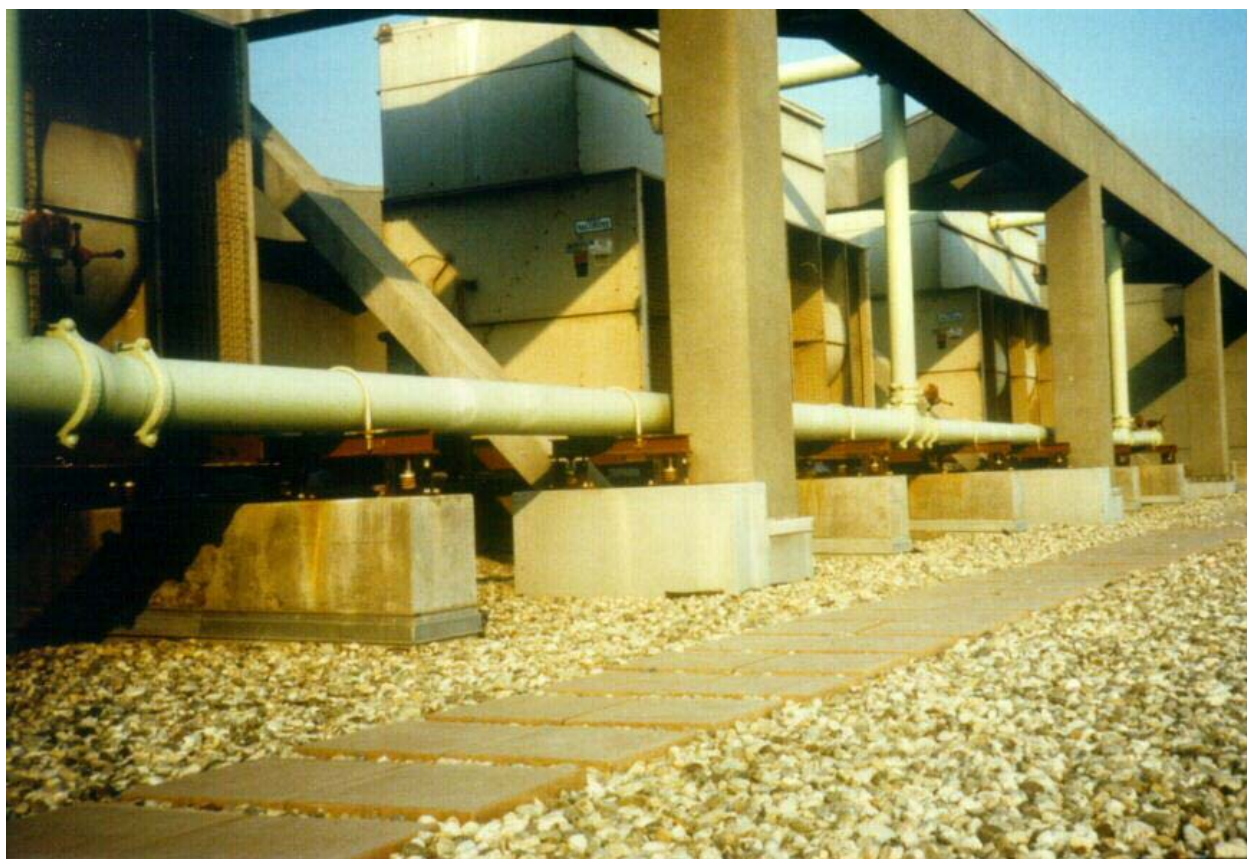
Roof-mounted supports with vibration isolation (Photo courtesy of Mason Industries).
